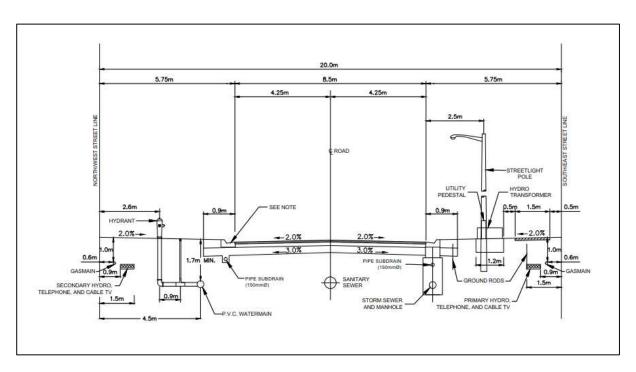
Township of Clearview Standard 8.5m Road with 20m R.O.W. - Urban Cross-Section
